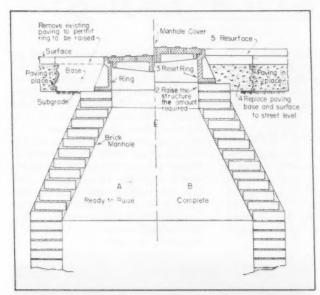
, showing ordinary methods of raising manhole frames by cutting pavement and rebuilding top of structure.
